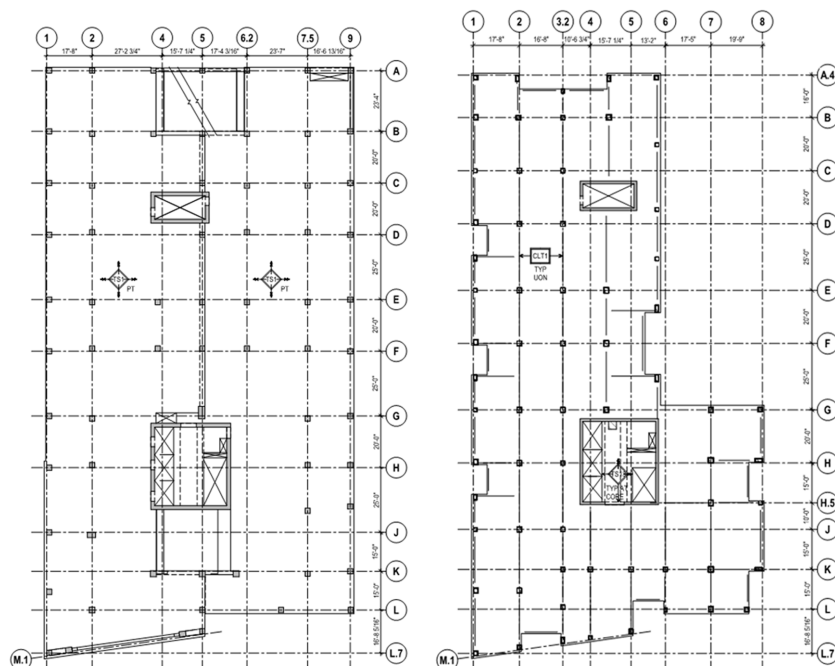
Typical Mass Timber Floor. (© Thornton Tomasetti)
